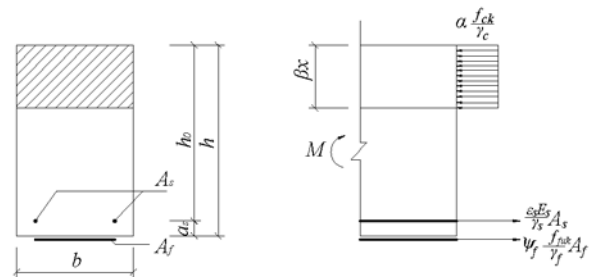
Cross section of reinforced-concrete beam strengthened with CFRP sheet
